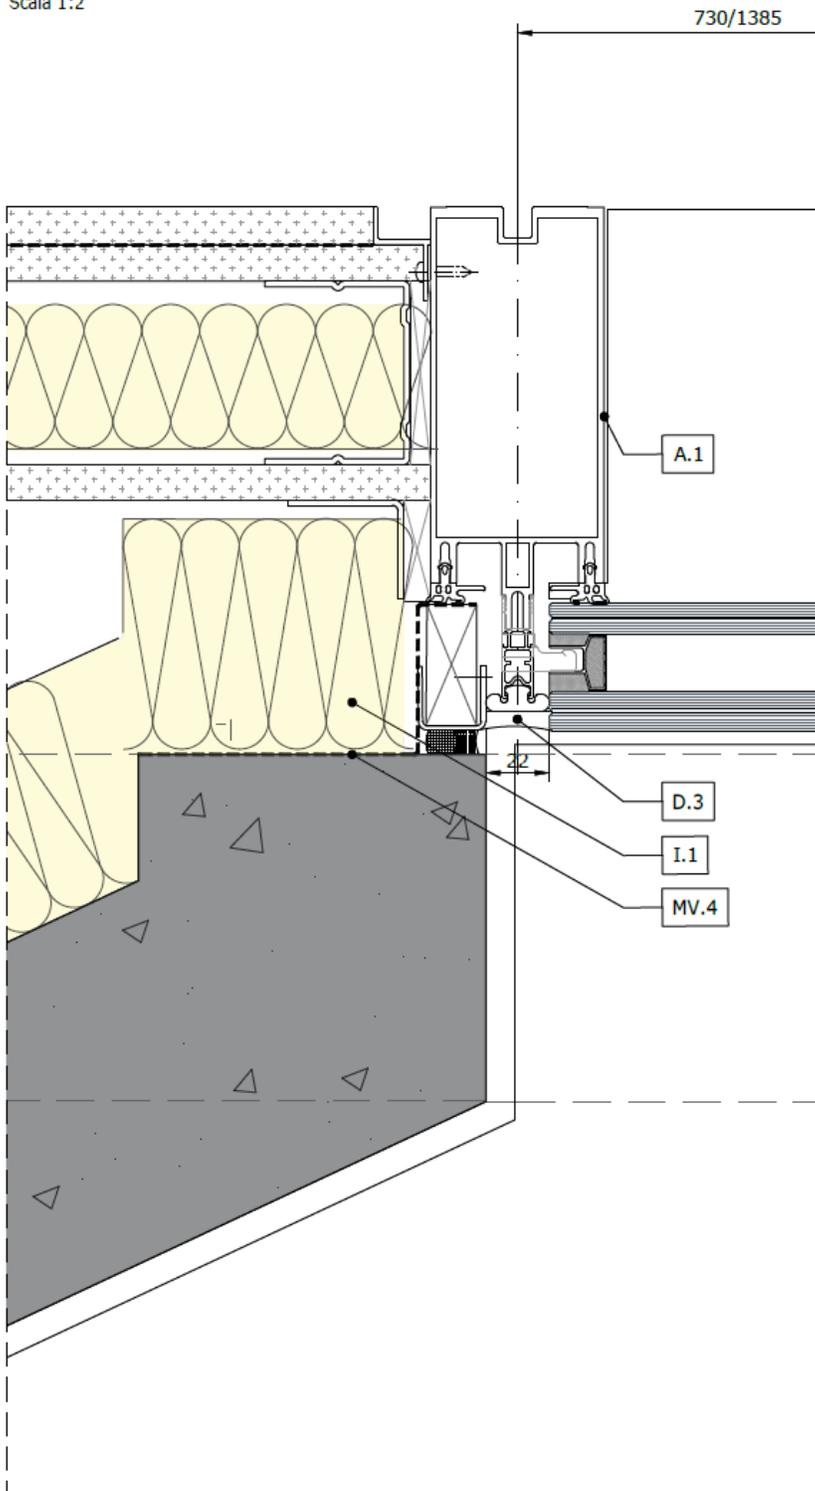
East Elevation WT-IC façade module typical plan Detail 1. Source: Author
